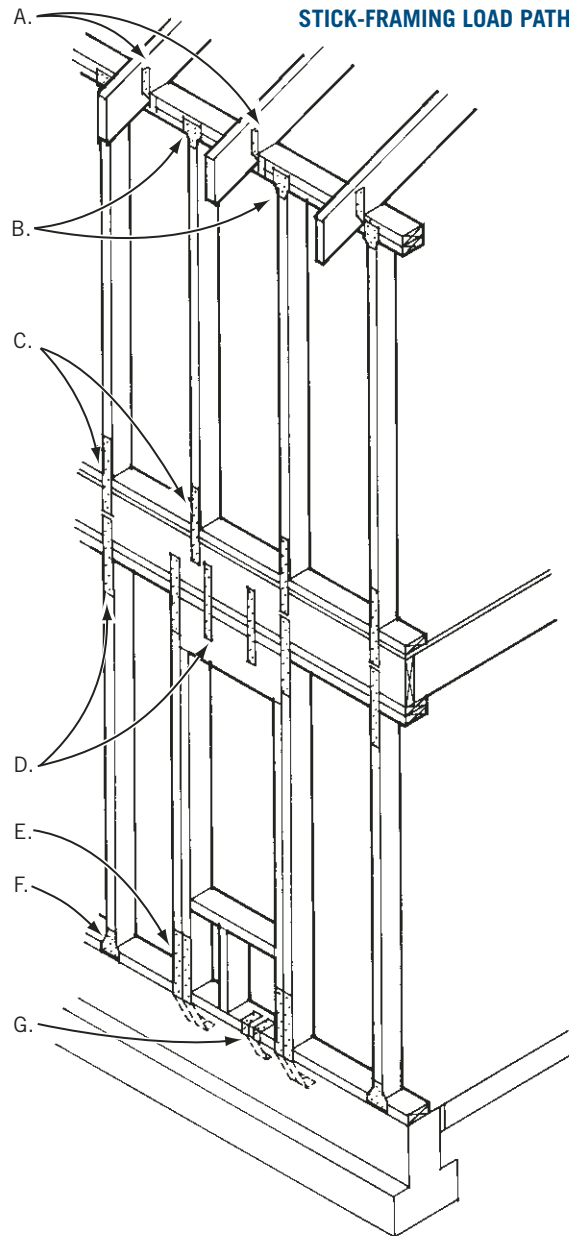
“To meet the uplift loads induced by a 120-mph wind, they have to put hurricane straps on every rafter or truss and on practically every stud, and they have to strap from stud to stud across the band joist between the first and the second floor. It can add \$15,000 to the cost of a big custom house.” The difference makes SIP homes cost-competitive with stick homes in his area, says Chaleff — leaving him free to focus on the energy performance advantage of his preferred building system.
